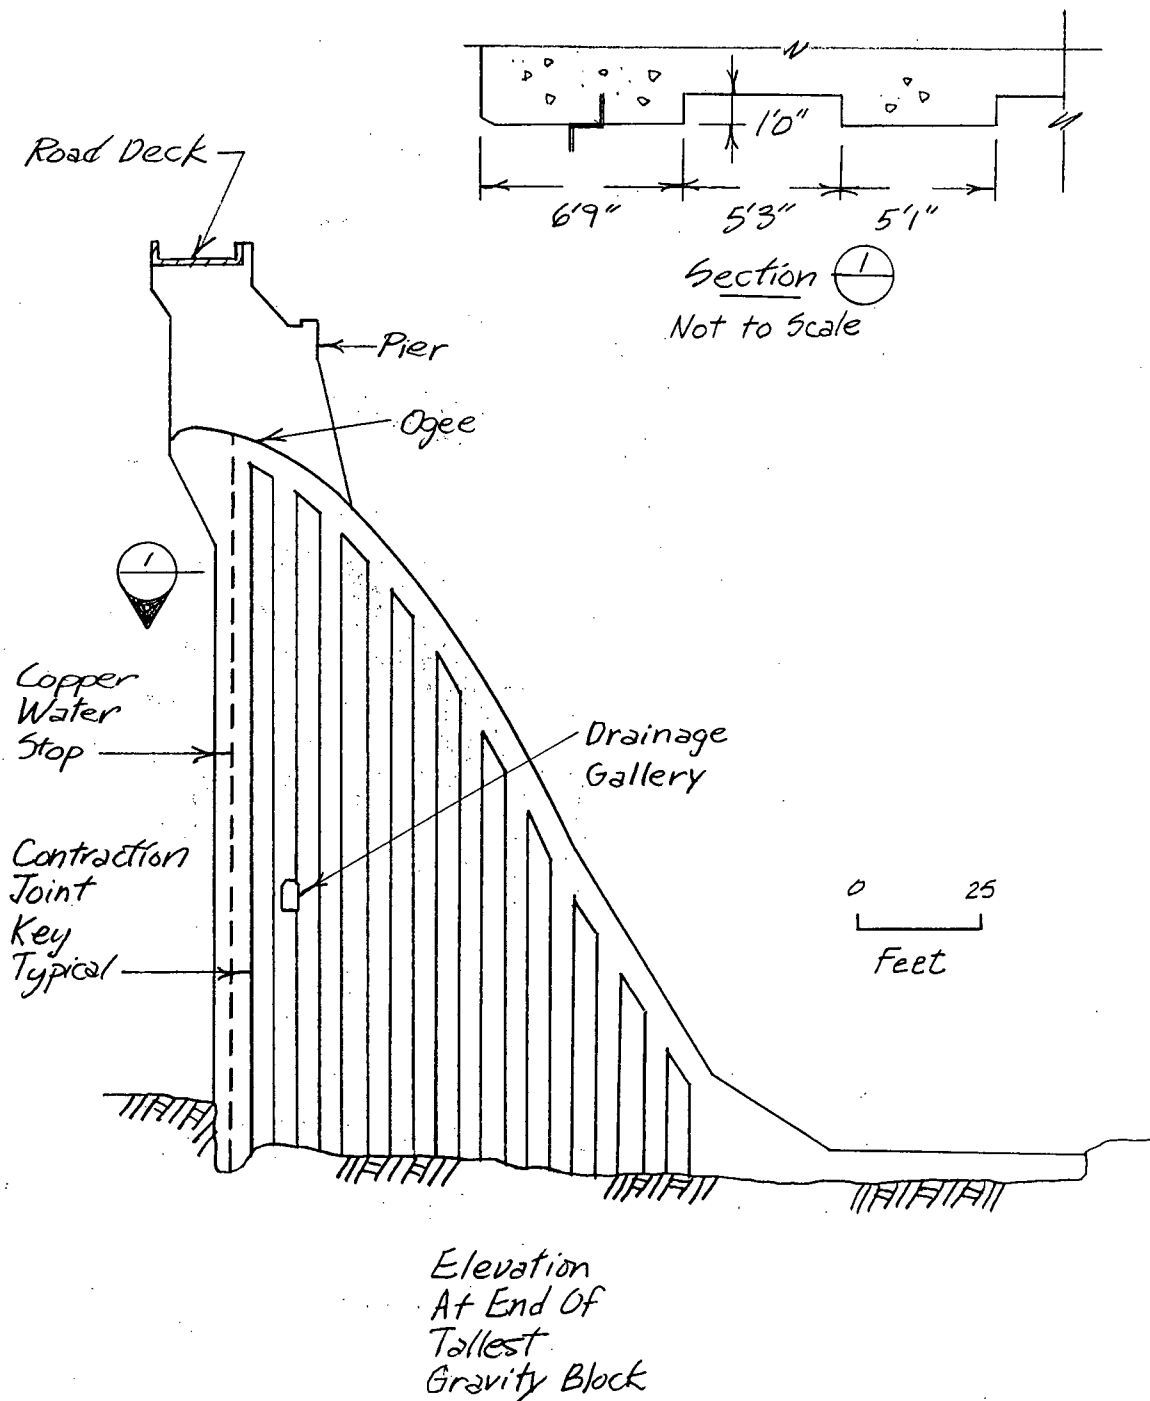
Ruskin Dam: Details of Vertical Contraction Joint
